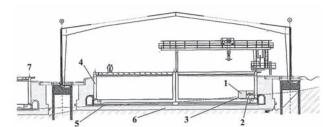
Barriers of the repository, 1- matrix, 2 - fiberreinforced concrete container, 3 -backfilling, 4 - steel-reinforced concrete facilities of disposal boxes, 5 - drainage layer, 6 - clay sealing, 7- geological formation
